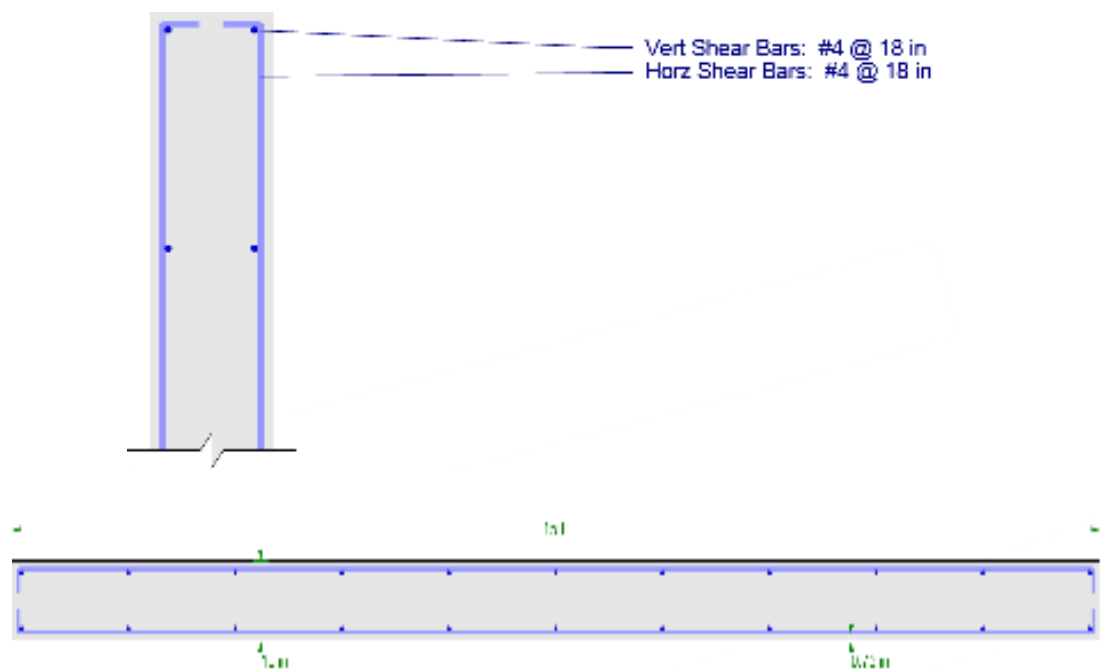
Building (B12-12S-L-O) Ordinary RC Shear Reinforcement Details; Wall Section for Floors 10-12
